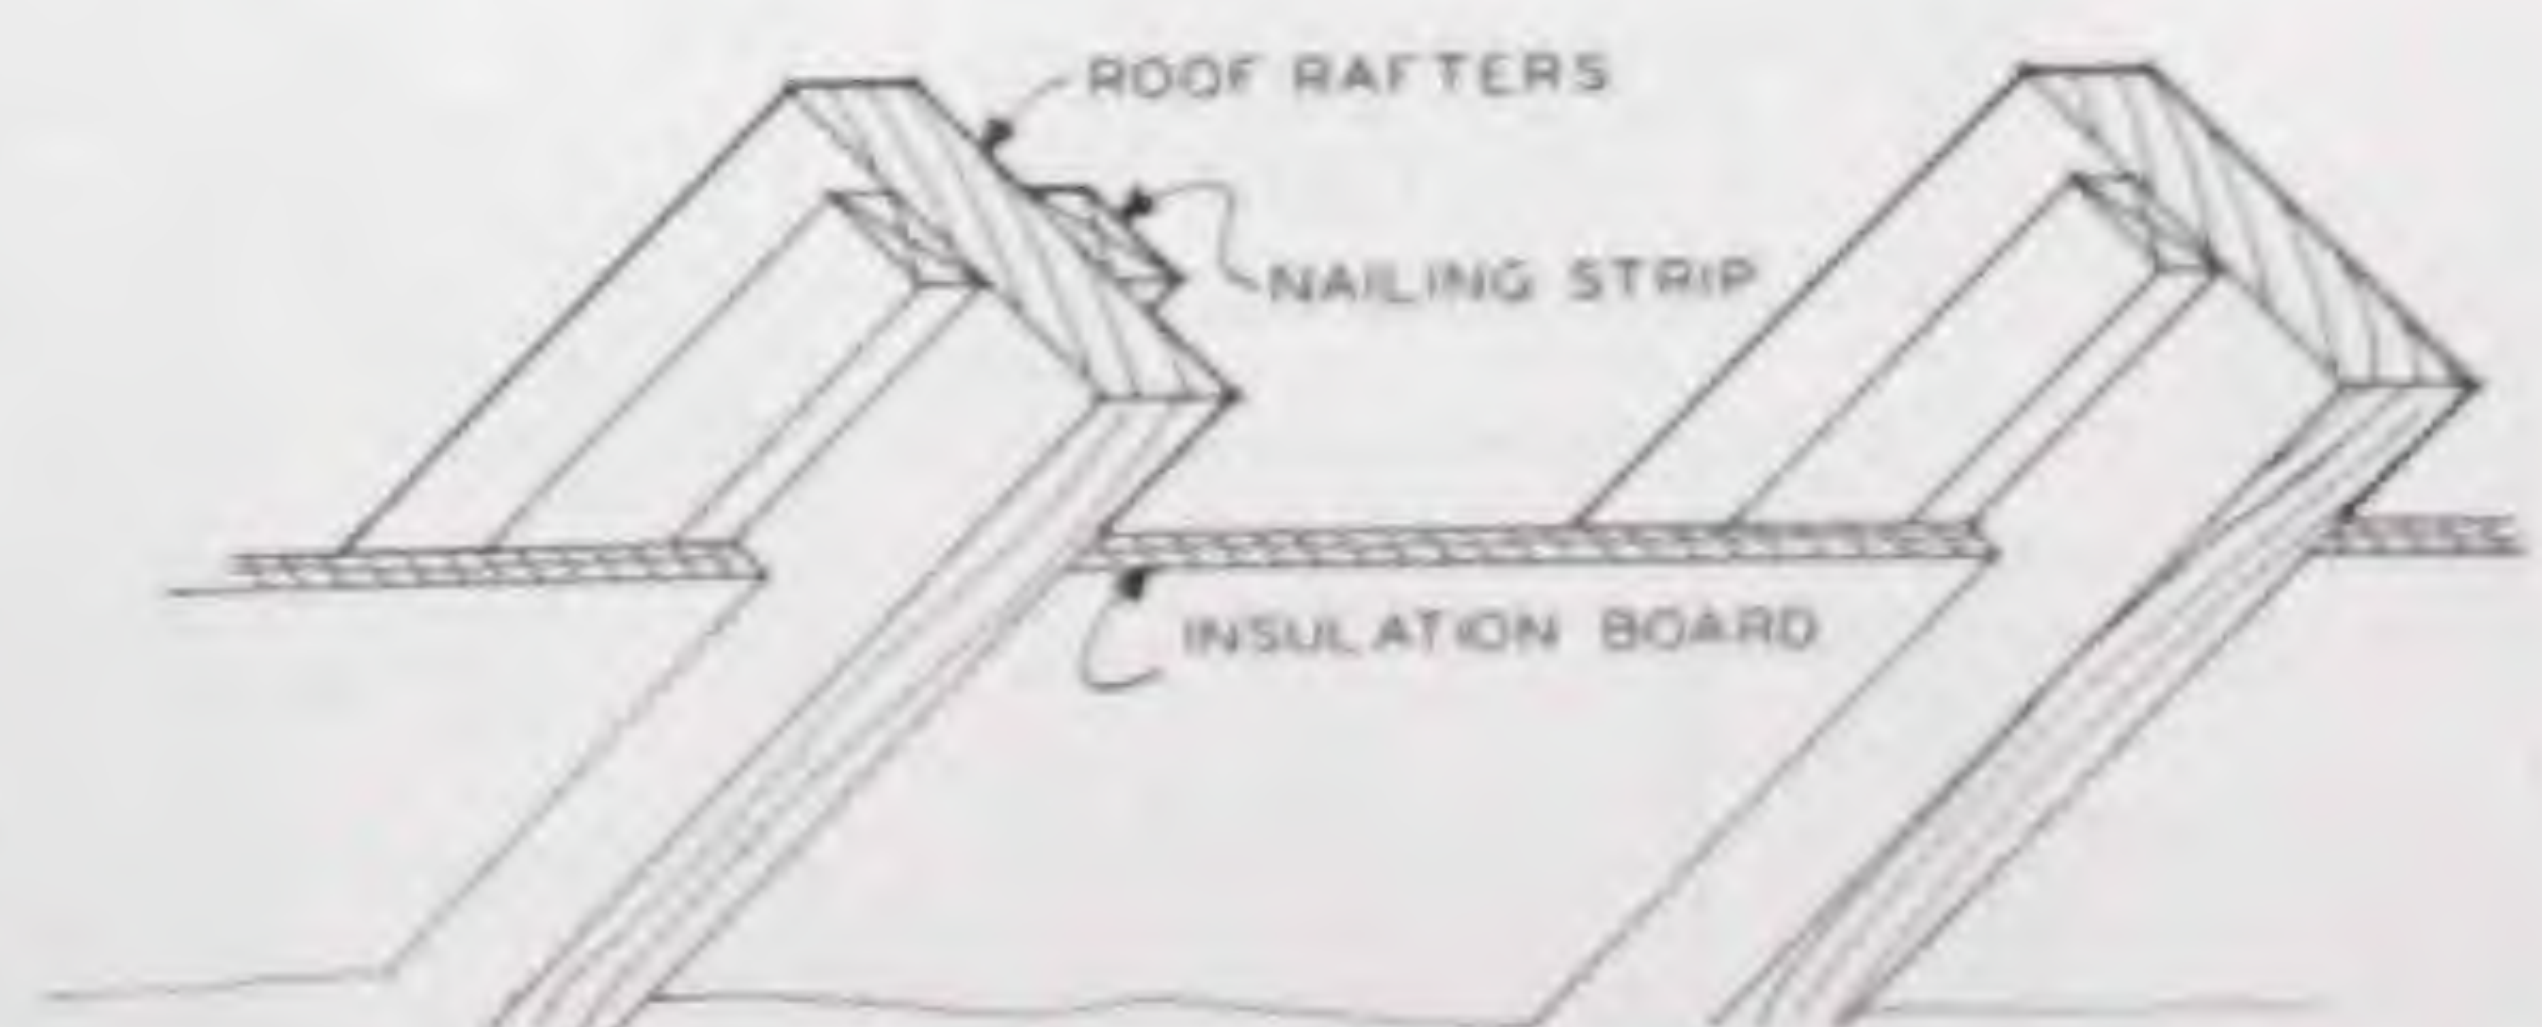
Insulation board between roof rafters, nailed to wood strips.
